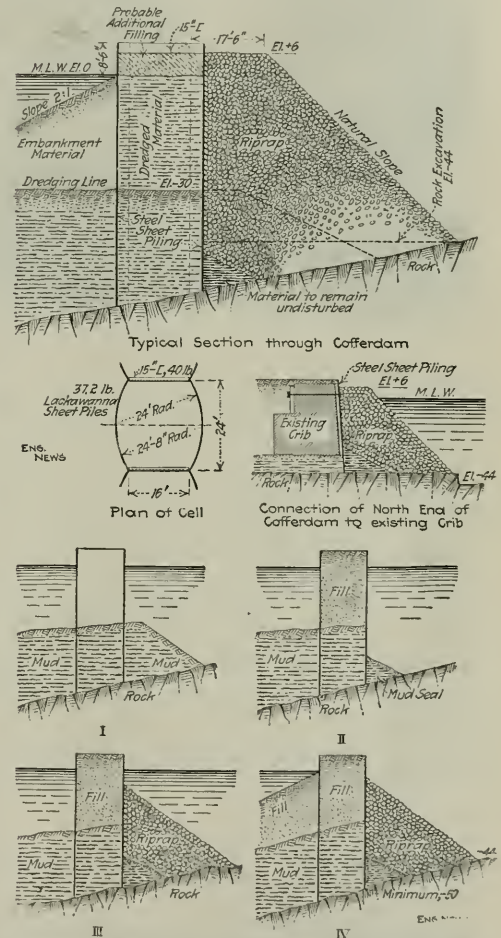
DETAILS OF QUAYWALL AND FILL CONSTRUCTION OF 46TH ST. PIER
